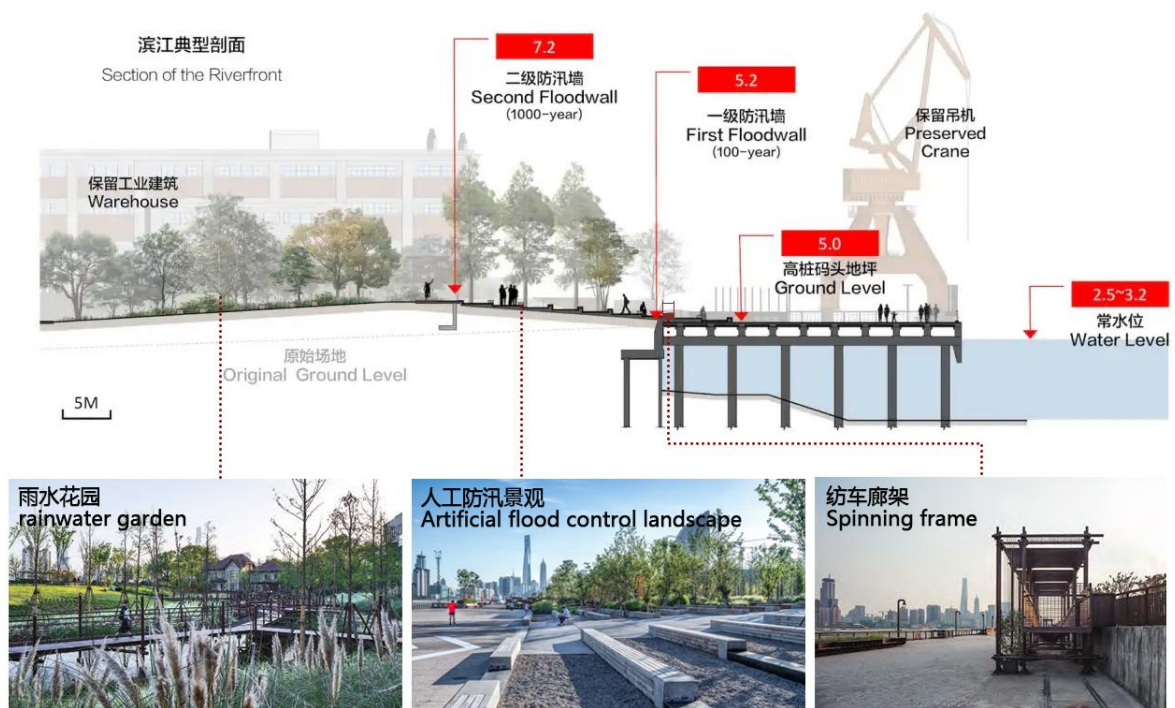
17 Yangpu Riverside Floodwall Section Design
